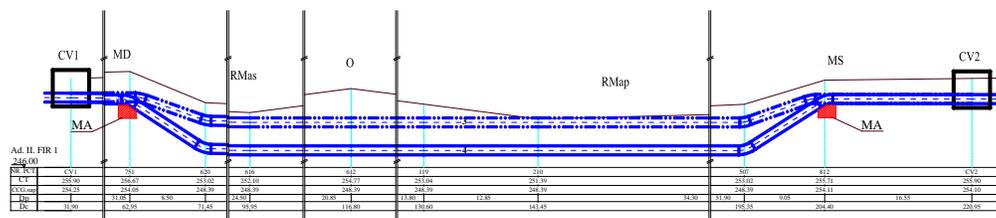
The longitudinal section of Ad IIa adduction pipe undercross.
